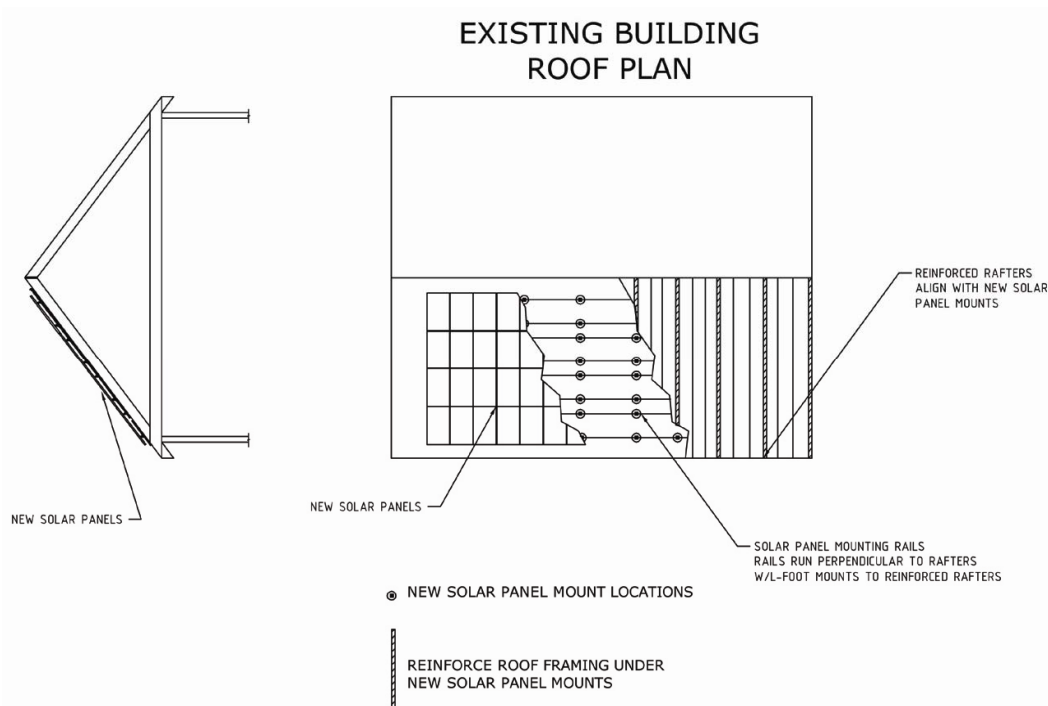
Typical Existing Building, Solar Panel Roof Installation
